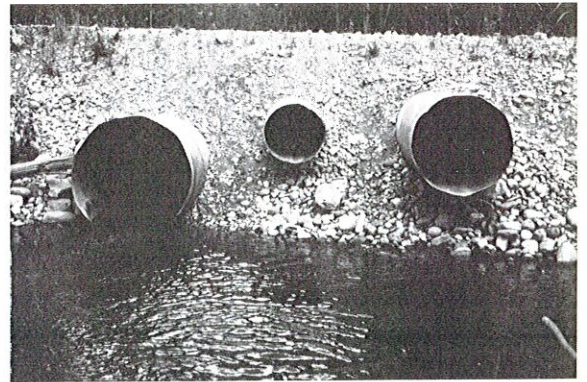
MULTIPLE CULVERTS. These are inadequately designed and placed. A larger culvert, properly placed, or a bridge would serve better.
